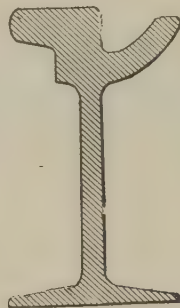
GROOVED GIRDER RAIL—NEW YORK TYPE.
